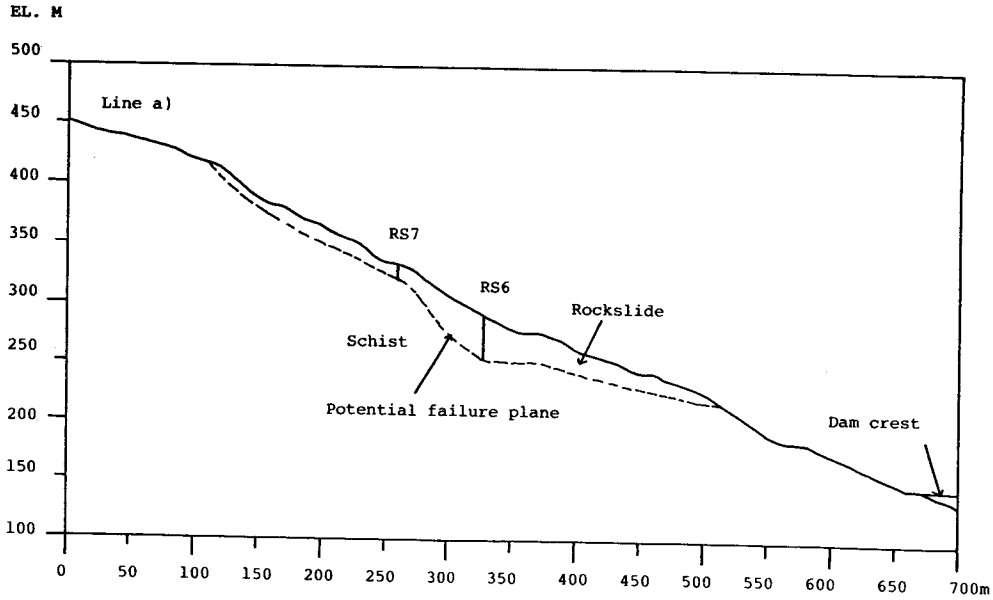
Profile of rockside area after dam construction shows a local slope instability at over the elevation 220m. Location of line a) is shown in Fig.3.
